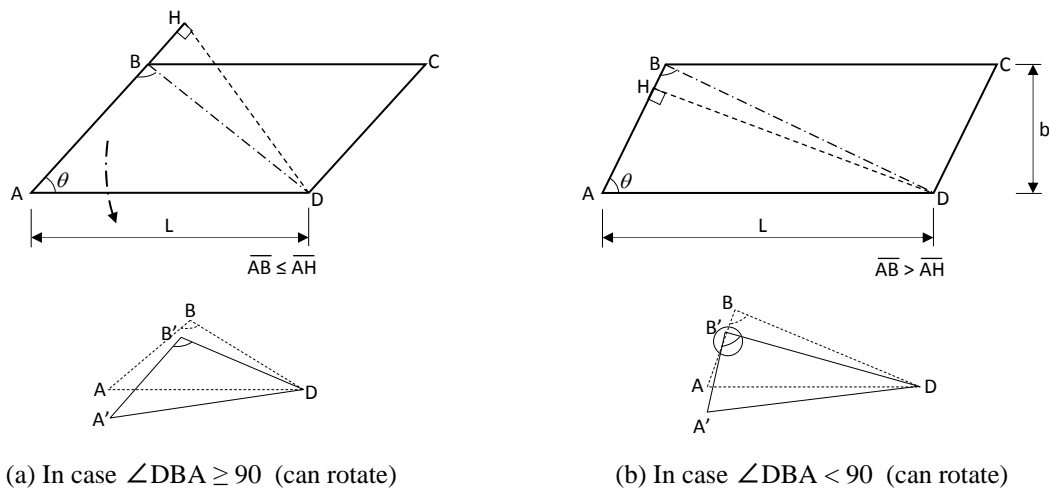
Conditions in Which a Skew Bridge can Rotate without Being Affected by the Adjoining Girders or Abutment
